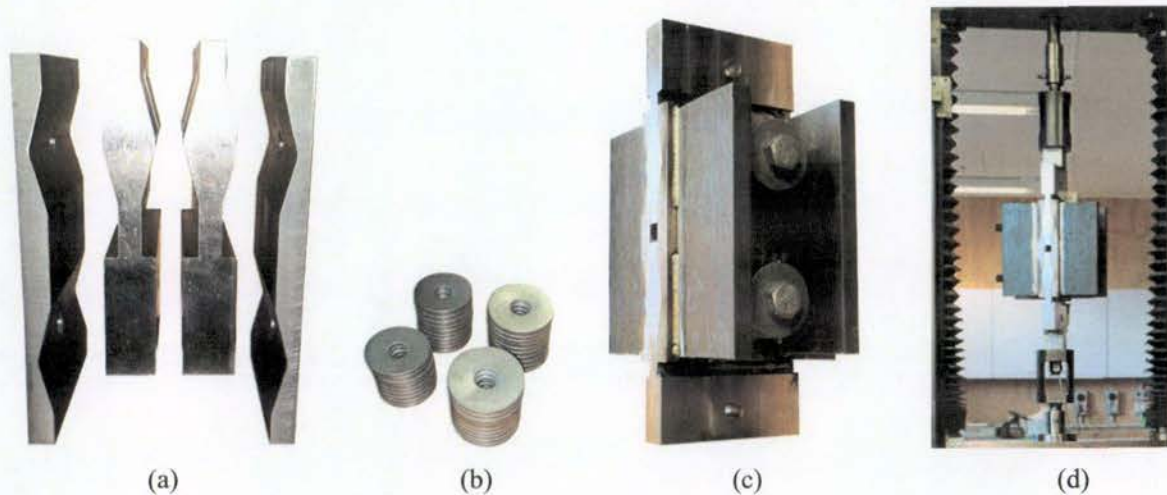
RSF joint specimen: a) Cap plates and centre plates b) Belleville washers c) Assembly d) Test setup
